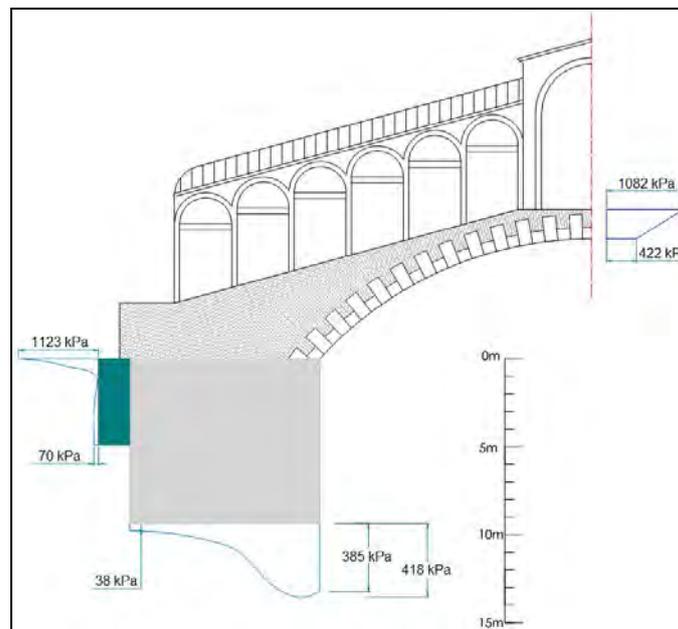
Stresses on the foundation base, foundation buttress and bridge vault.
